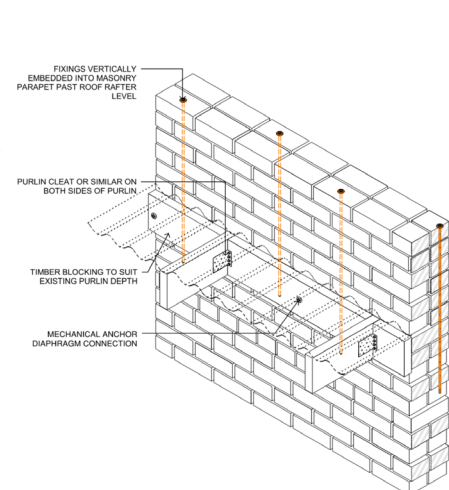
Parapet retrofit with post-installed mechanical anchors (schematic supplied by: PYTHON Fixings)
